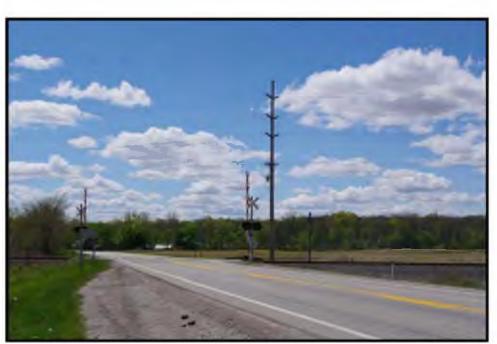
Photo Point 36: overview of Physical APE from CR 30, camera facing northwest.
